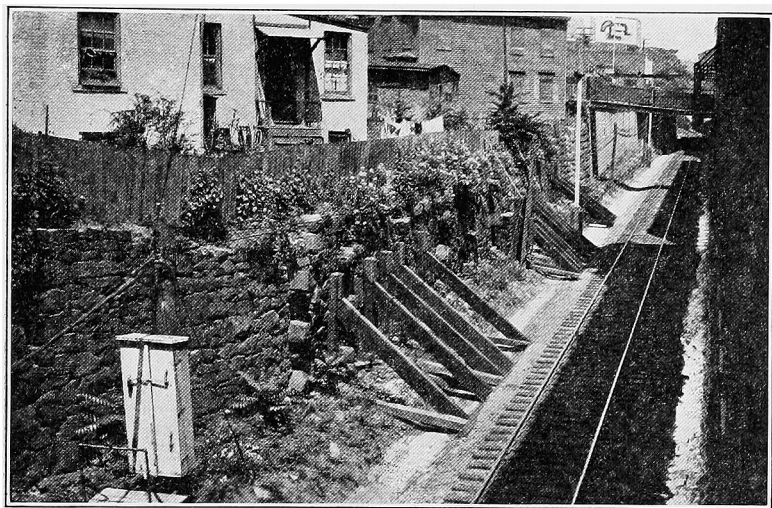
WEST WALL OF LOCK NO. 27, NEW HAVEN, CONNECTICUT.
